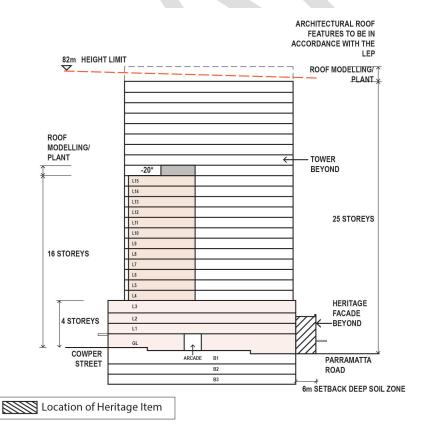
Building envelope section C-C (\*final height of tower to be determined through the Design Excellence process)
